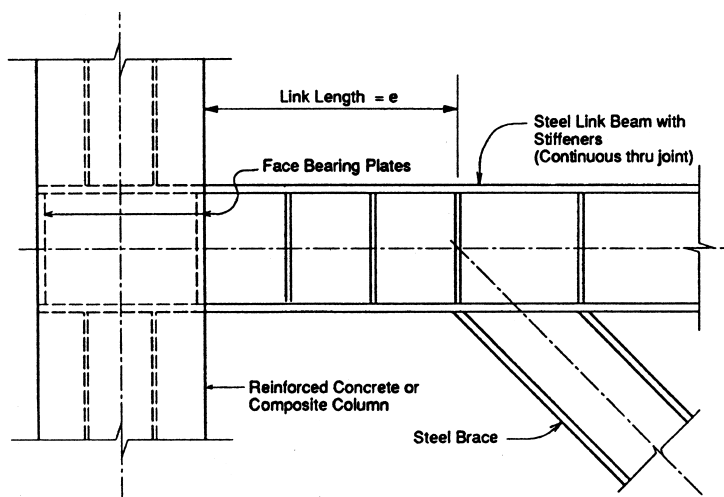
Reinforced concrete (or composite) column-to-steel eccentric brace.
